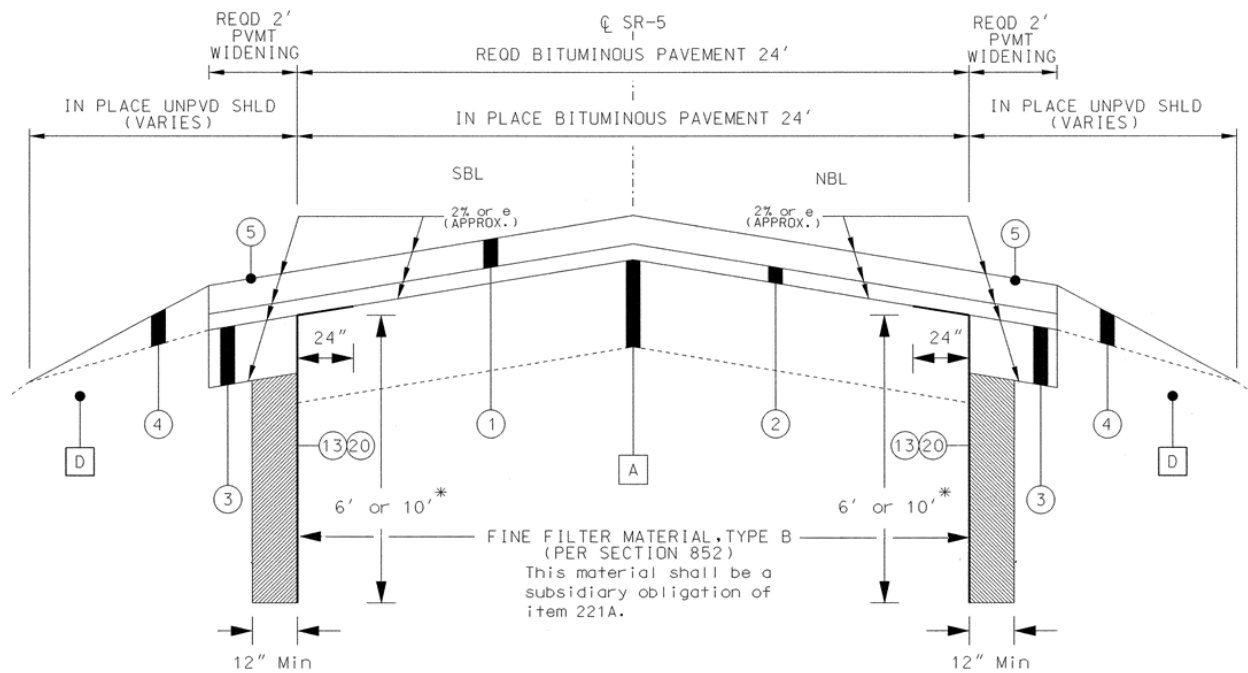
Vertical Barriers Cross Section (ALDOT 2015)
